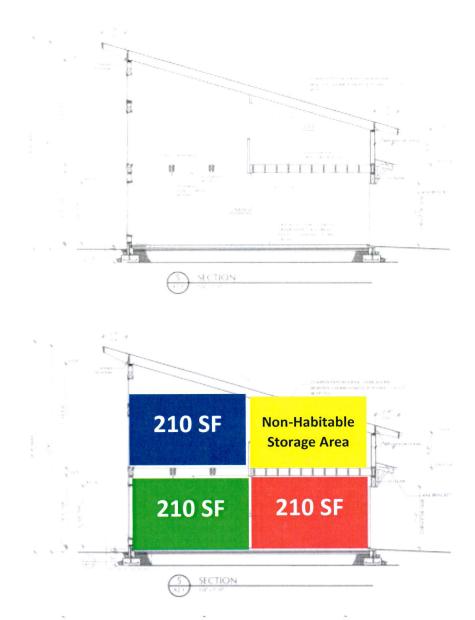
Harding Accessory Structure, Elevations, dated March 22, 2019
